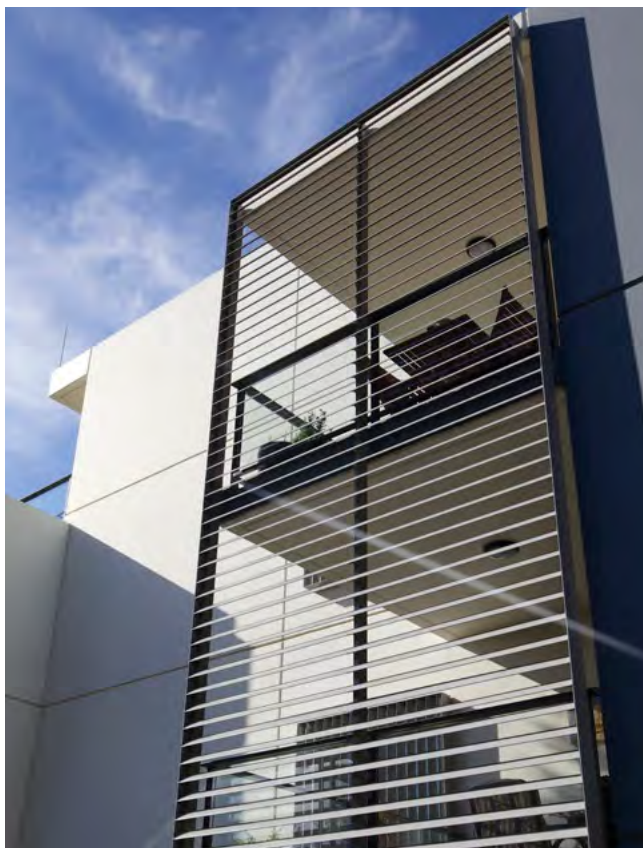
A.3 Horizontal louvres are most effective on north facing elevations and achieve summer shade and winter sun access
